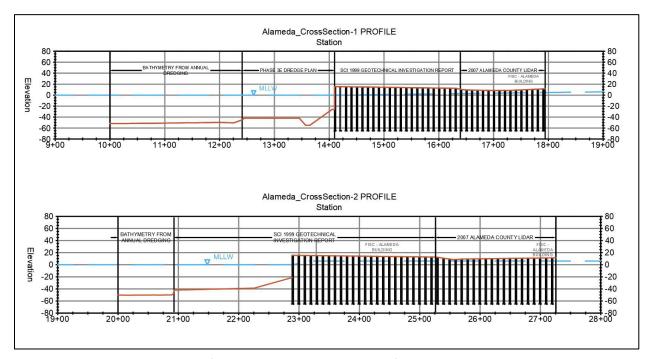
Alameda Cross Sections of Existing Grade at Alameda Wharf
